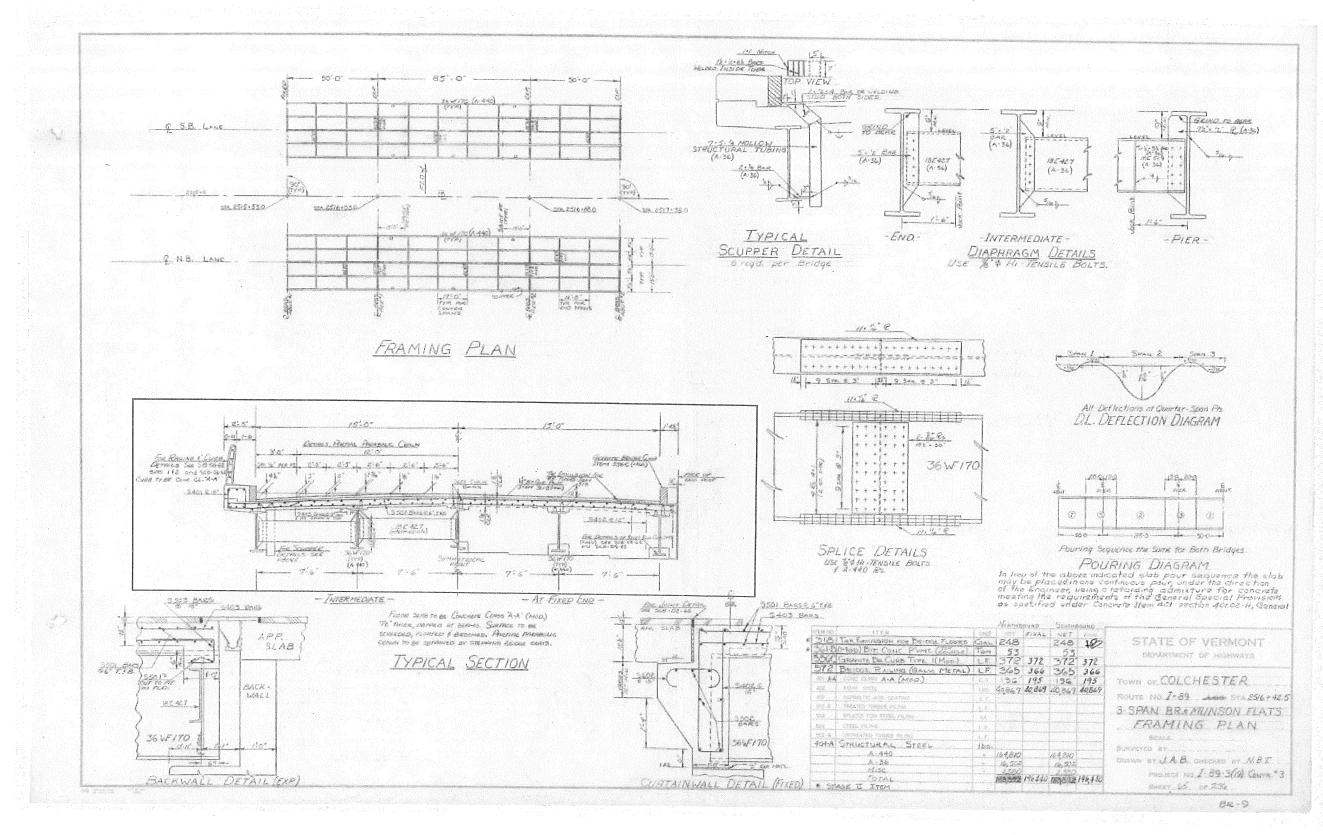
Colchester IM 089 3(69) - Bridge 77 (Page 9)
